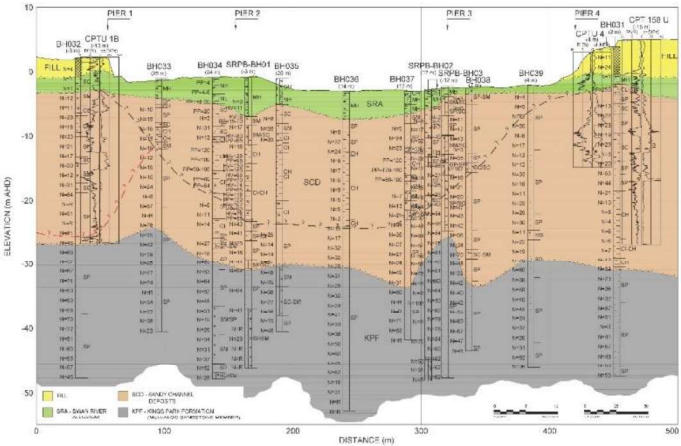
Inferred subsurface profile along the proposed bridge centreline
